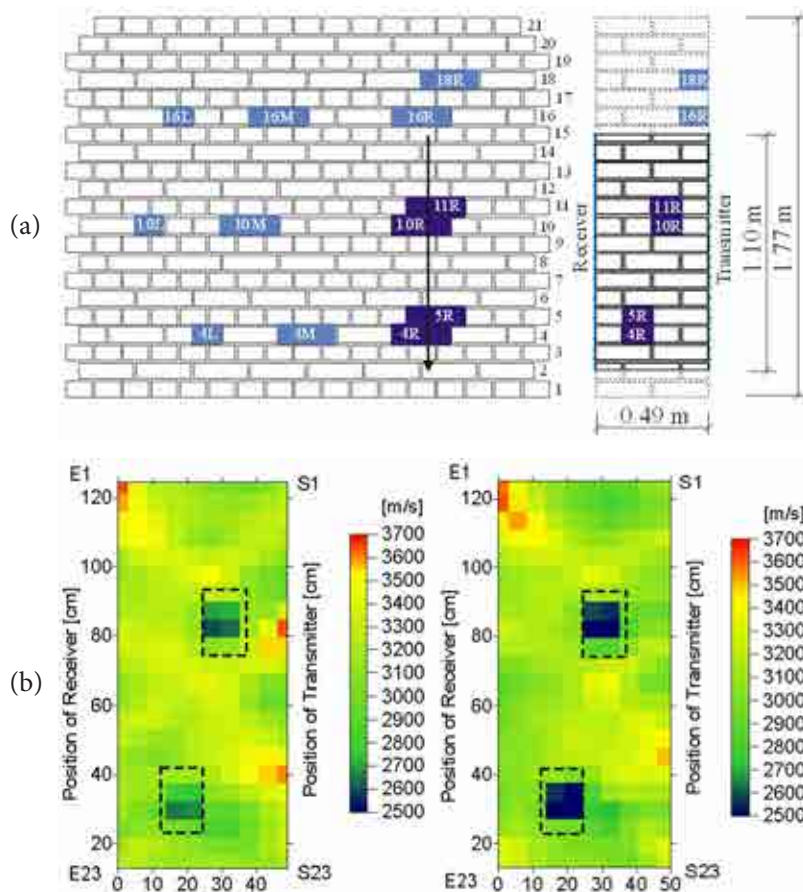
Acoustic testing of masonry wall with simulated air voids: (a) masonry wall specimen; (b) detection of simulated air voids in masonry wall using acoustic tomography [464].
